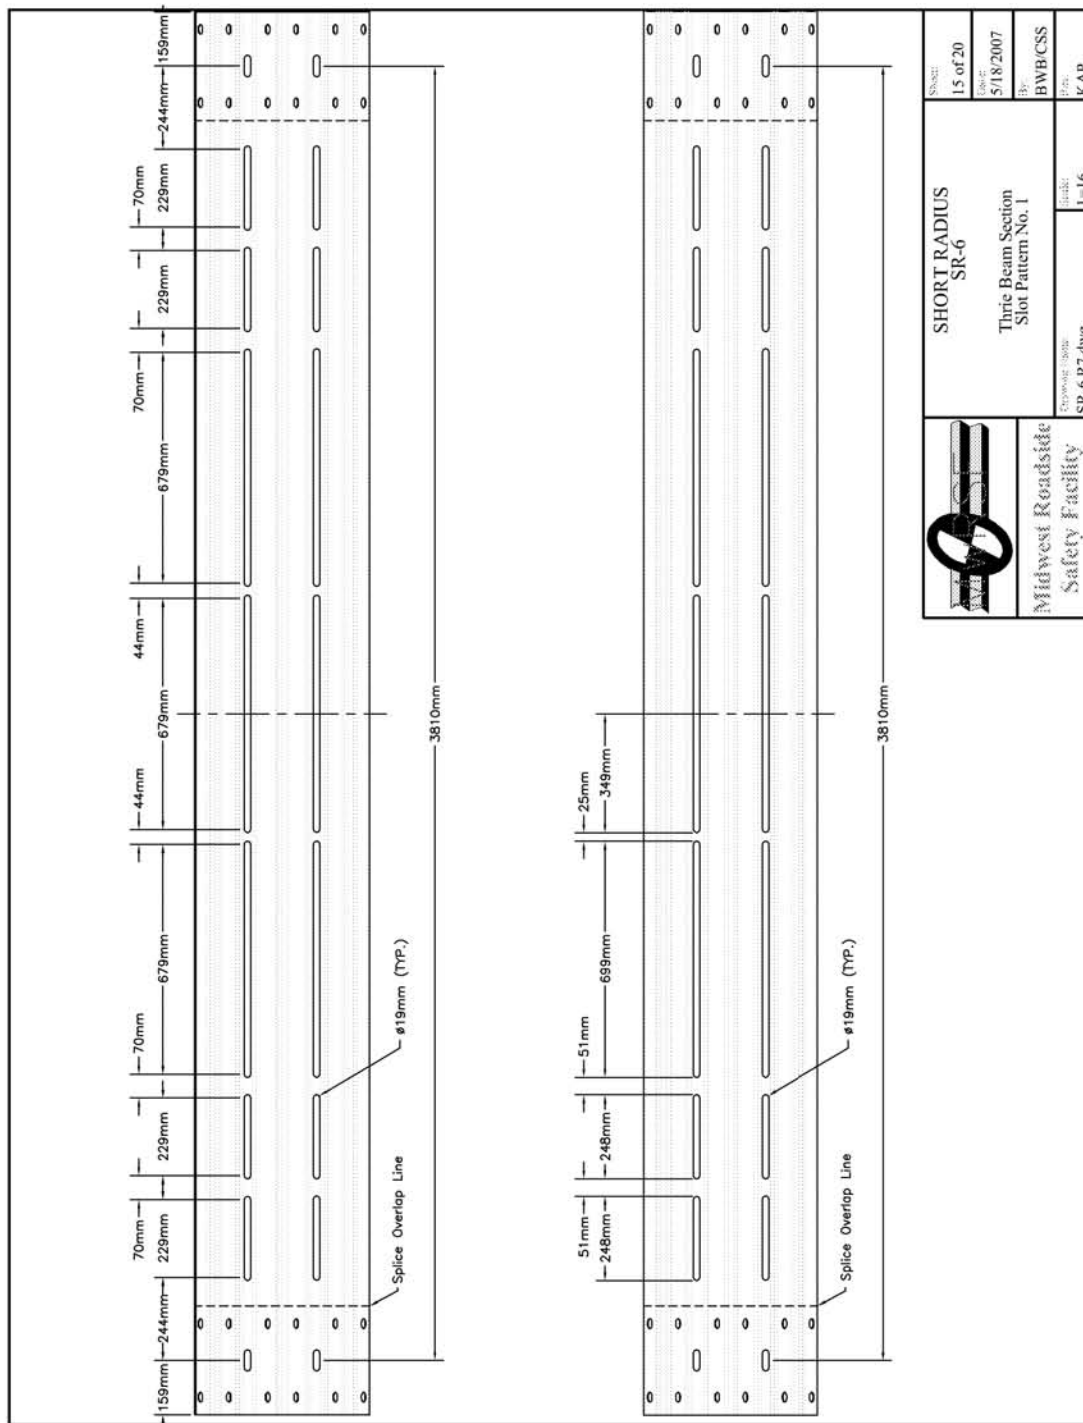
Rail Slot Pattern Details, Rail Section No. 1, Test SR-6
